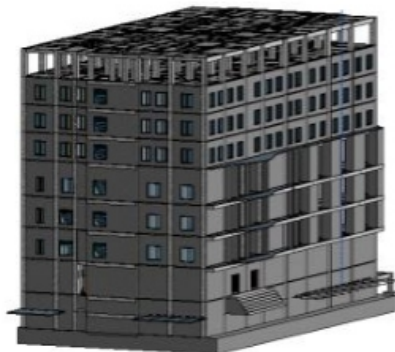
8th floor level beam Figure 32: 9th floor level and slab, 6th FL wall and floor and column and 8th floor level stair and 5th FL D & W for phase 21 shear wall, 7th floor level wall and floor and stair and 6th FL doors and windows for phase 22
